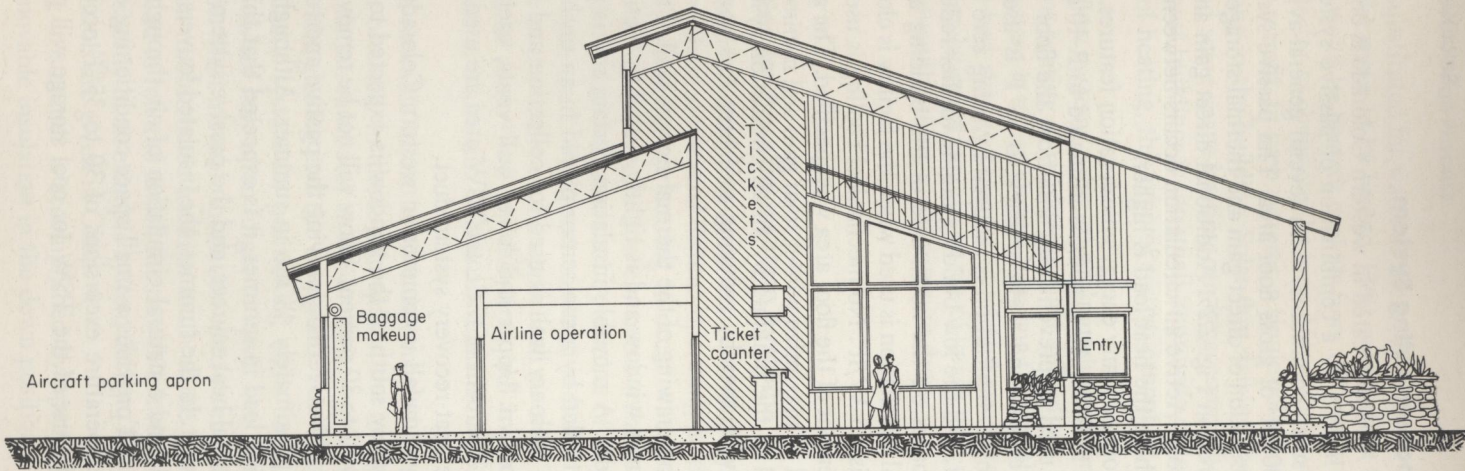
Building section of the Gunnison County Airport Terminal showing thermal-storage wall to the south and clerestory to provide natural lighting as well as direct-gain heating. (Courtesy of Associated Architects of Crested Butte, Colo.)
